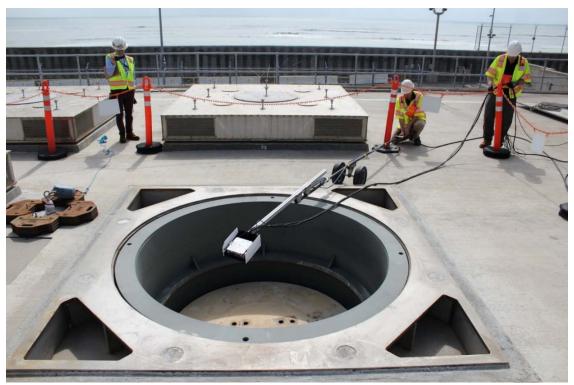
The inspection robot is held in a delivery tool and placed into the cavity enclosure container to begin the visual inspection of a loaded MPC
